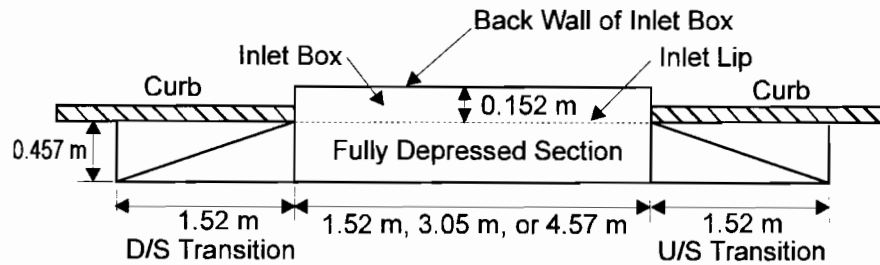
Plan View of TxDOT Type C and Type D Curb Inlets
